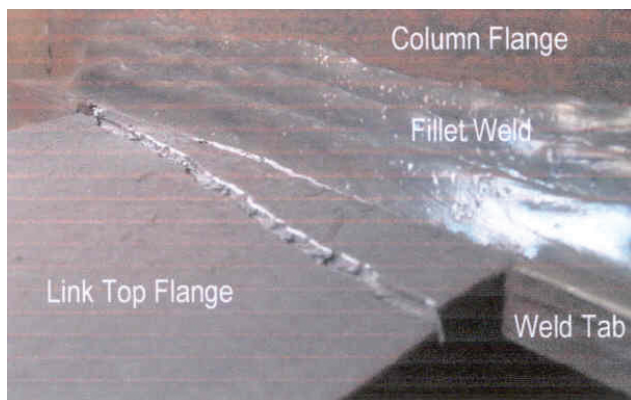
Fracture of link-to-column flange connection (courtesy of Professor T. Okazaki).
